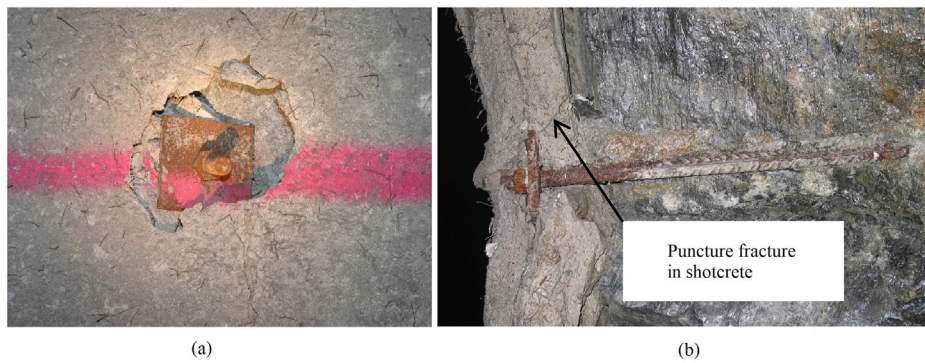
Puncture failure of the shotcrete behind the bolt plate.
